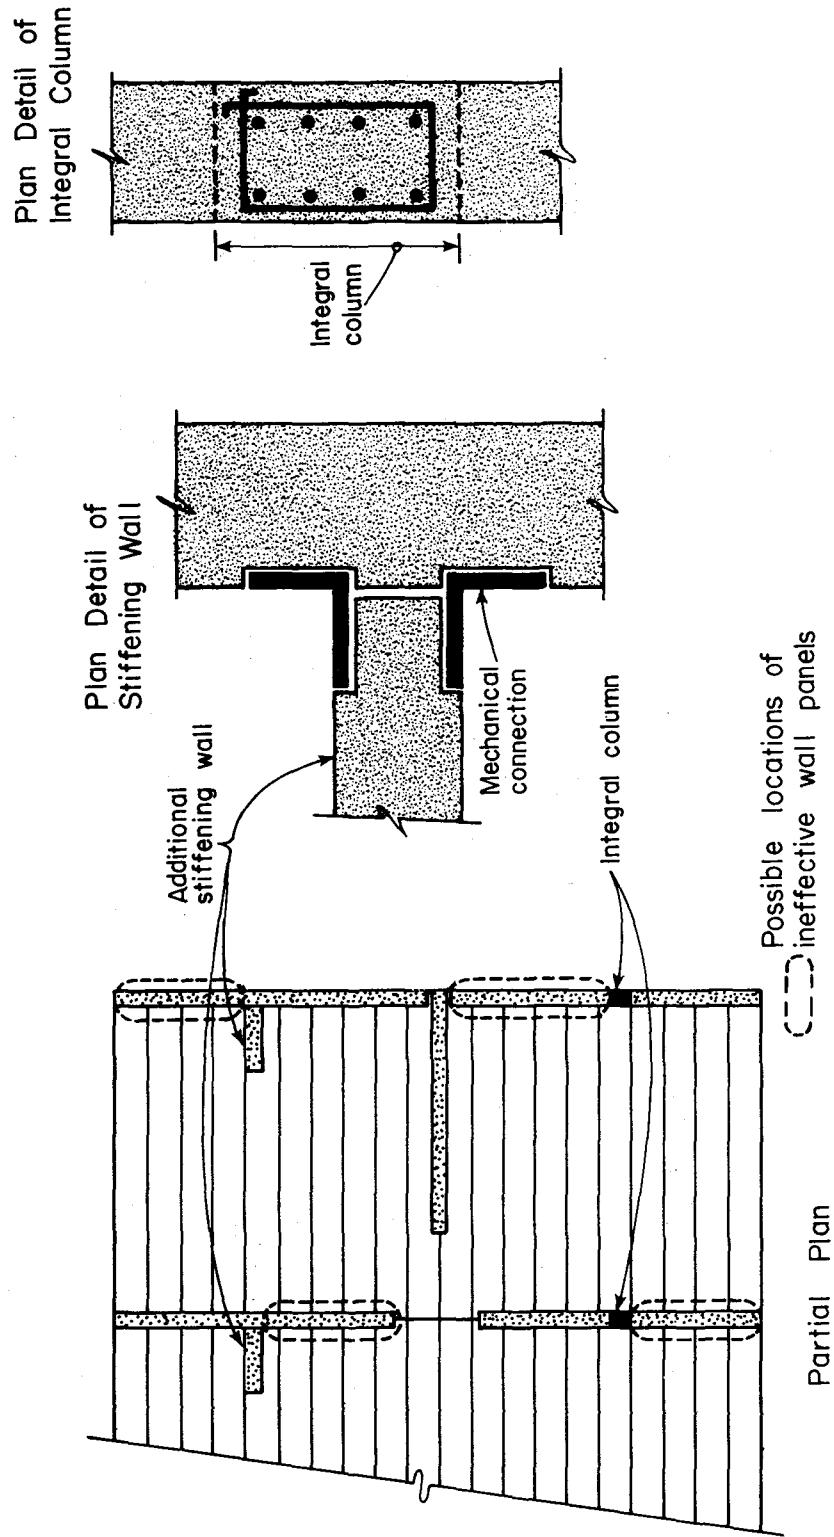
Extent of Assumed Wall Damage Under Abnormal Loads with Limiting Measures Taken
